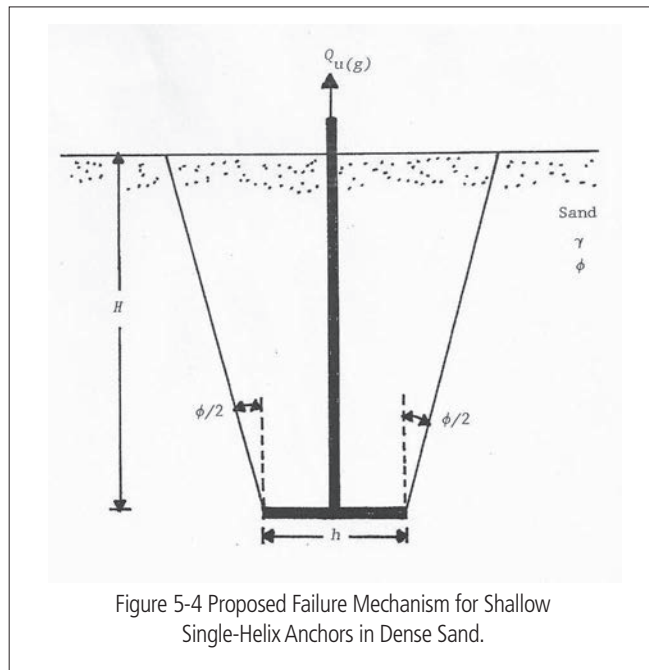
Proposed Failure Mechanism for Shallow Single-Helix Anchors in Dense Sand.
